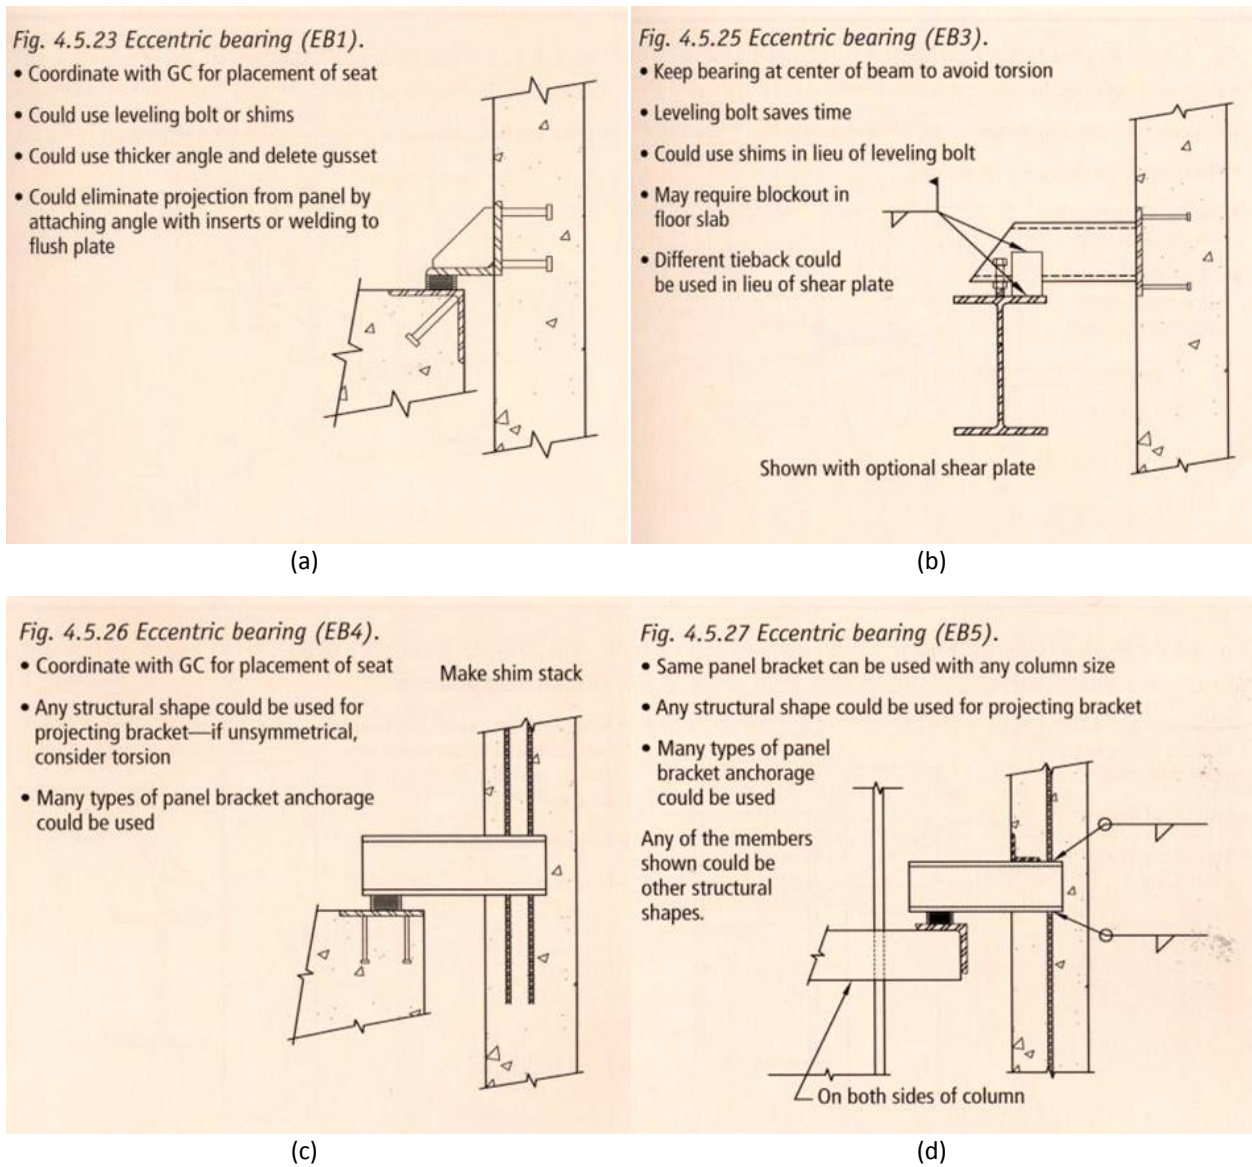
Eccentric Bearing Connections: (a) with steel angle; (b) with cast-in steel shape; (c)-(d) with projecting brackets (PCI 2007).
